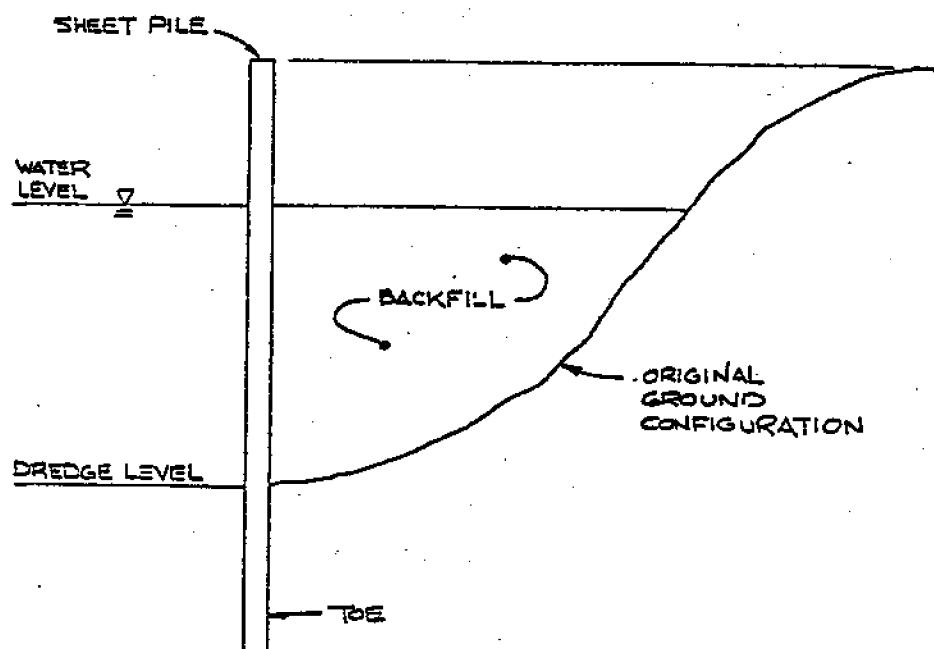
Cantilevered Sheet Pile Wall (Saczynski and Kulhawy, 1982, p. 14)
